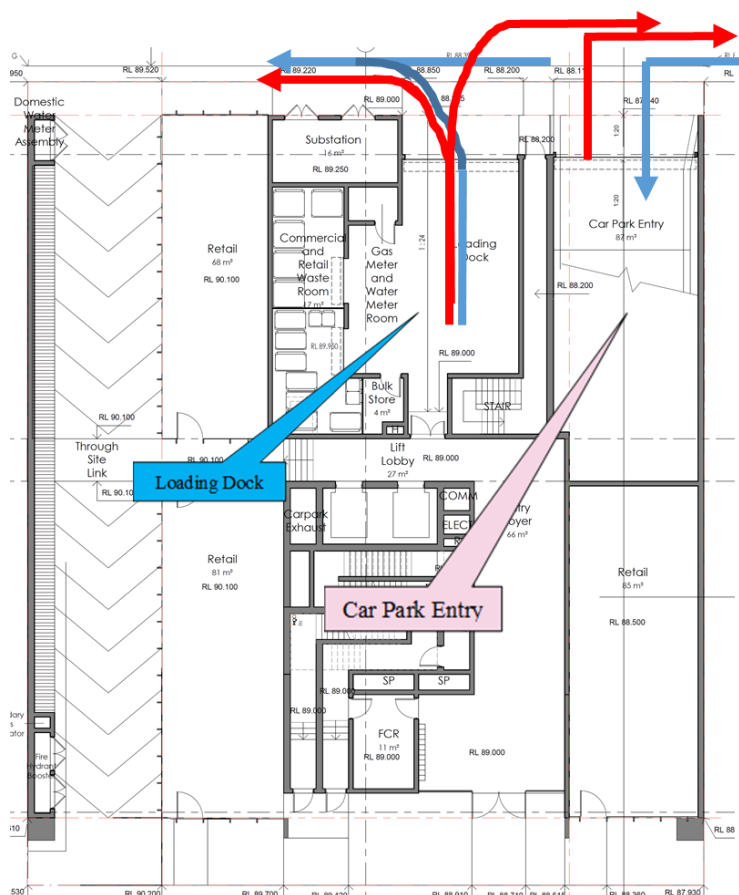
Ground Level layout, vehicles car park entry ramp and loading dock
